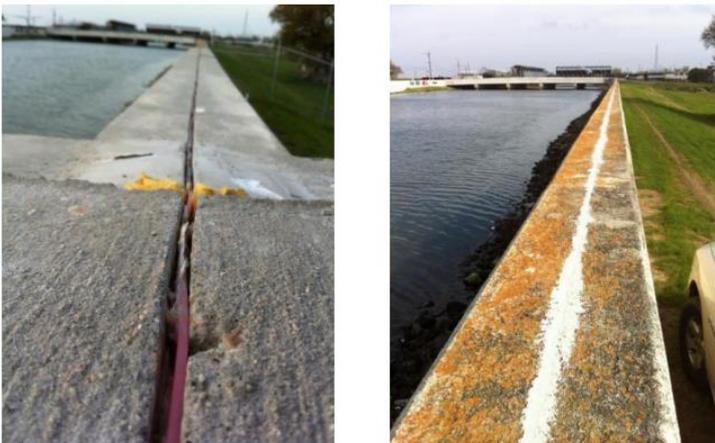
Installation of SMARTprofile sensor in a groove on top of the levee wall section.
